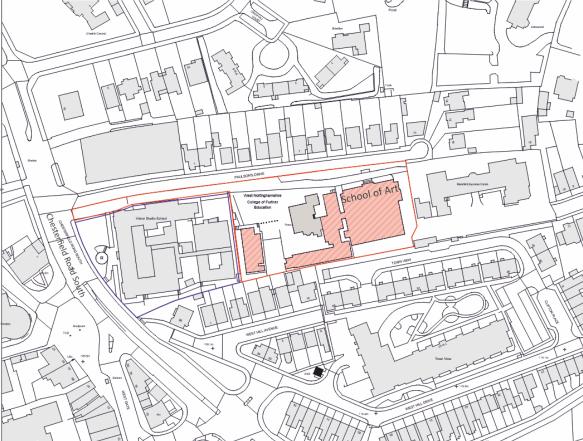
Vision West College, Chesterfield Road South, Mansfield. Site location showing buildings to be demolished in red
